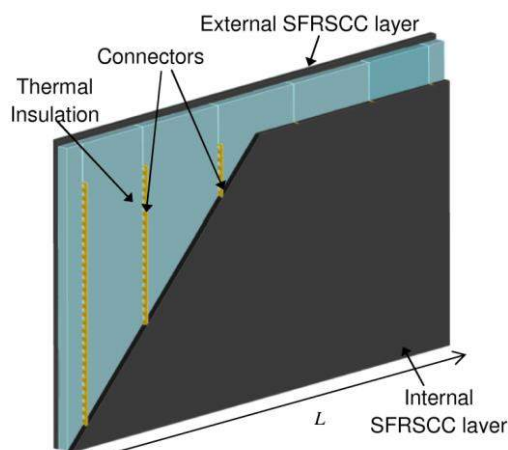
Proposed building system: components of the devised load-bearing sandwich wall panel.
